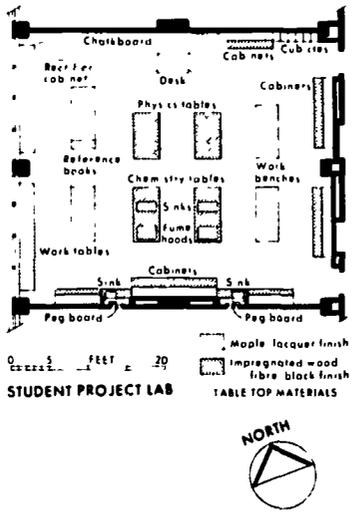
Floor plan of the Science-Mathematics Wing, Darien High School, Darien, Connecticut. Ketchum and Sharp, Architects, New York.
